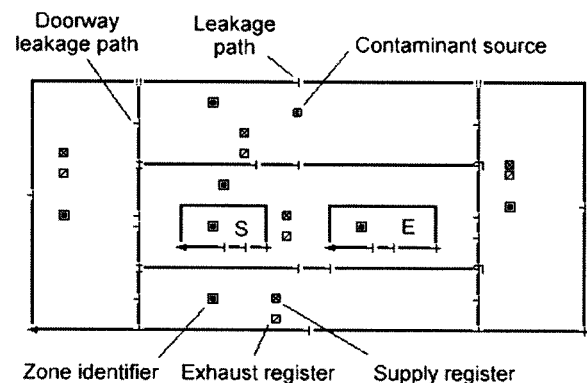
Floor plan for multizone building model five zones shown for each floor with stairwell (S) and elevator shaft (E) connecting all 40 floors
